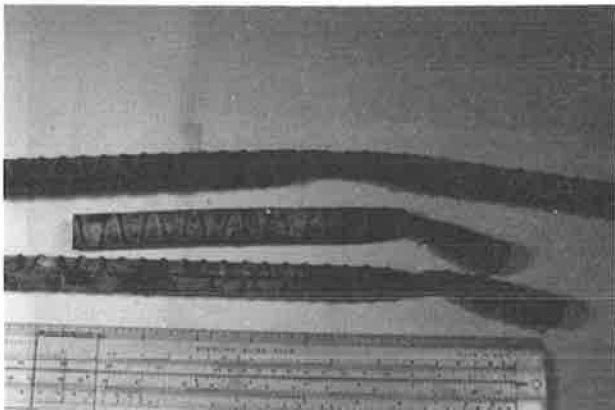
Localized corrosion due to crack in pavement overlay on I-90 in New York State (July 1982) (25).
